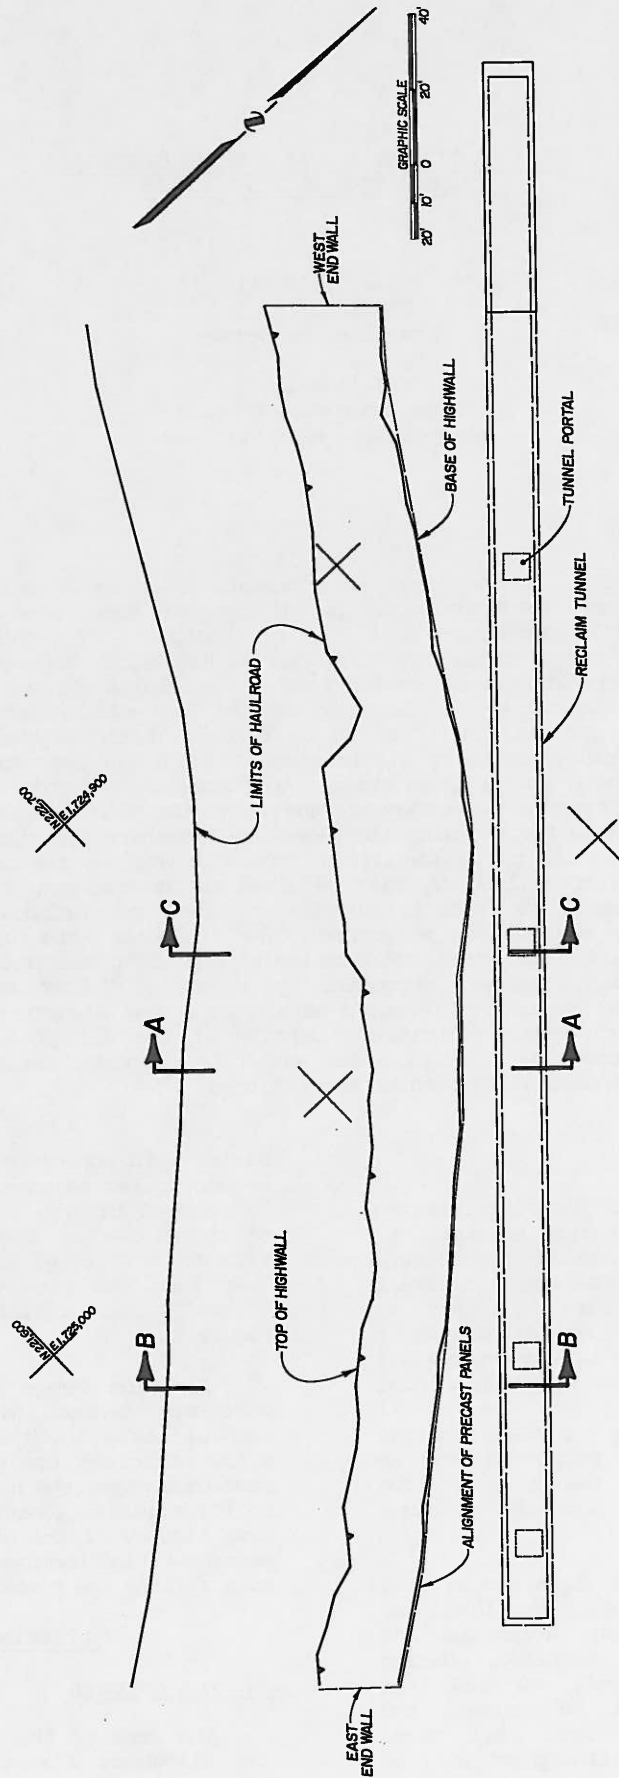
Plan view of the limits of the highwall and reclaim tunnel.
